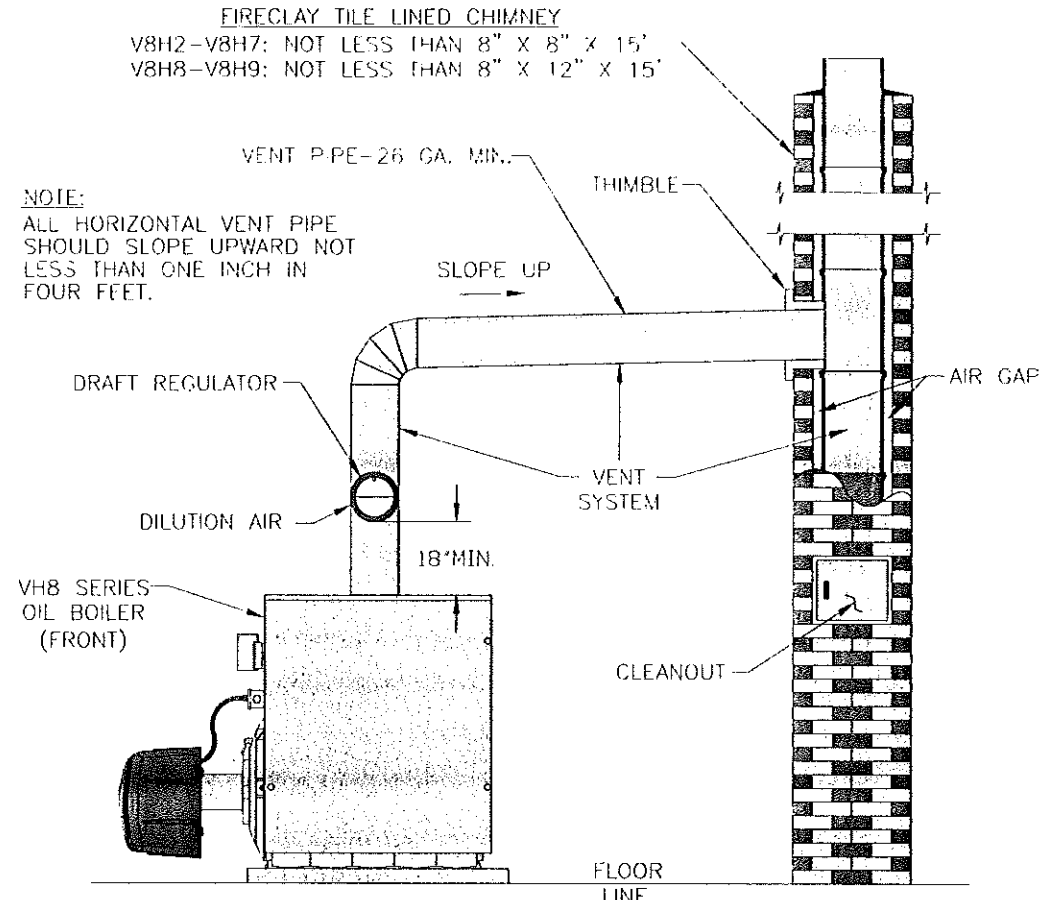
Recommended Vent Pipe Arrangement and Chimney Requirements
